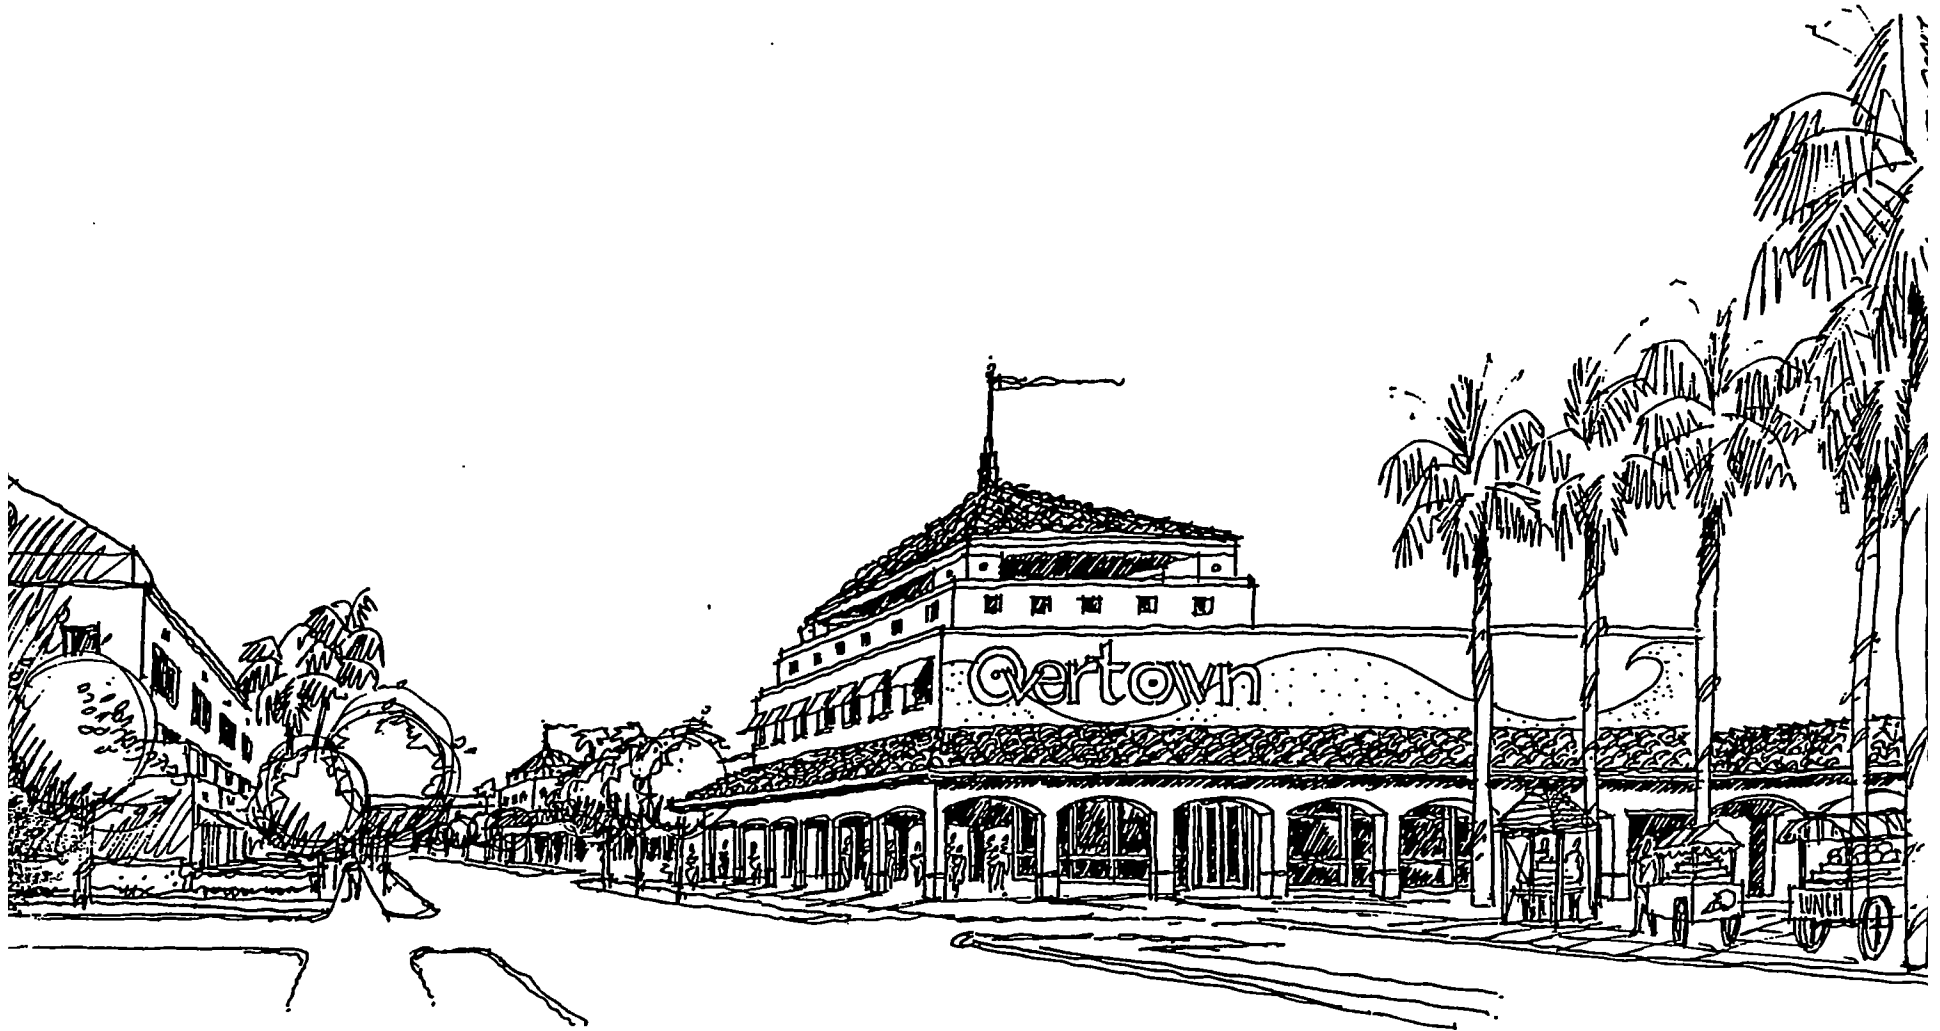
J: Overtown Shopping Center Renovation - View from NW 3rd Avenue
